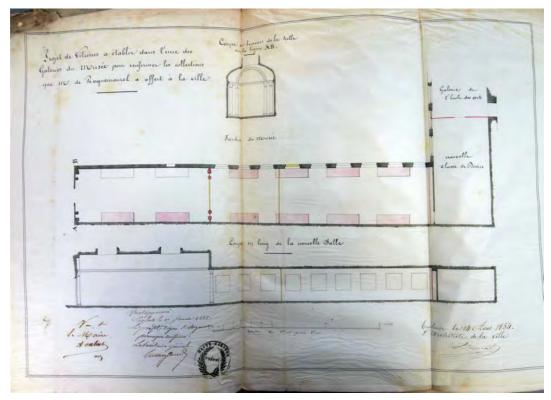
Architectural plans of the Galerie Rocquemaurel at the Musée in Toulouse, 1855. AMT
